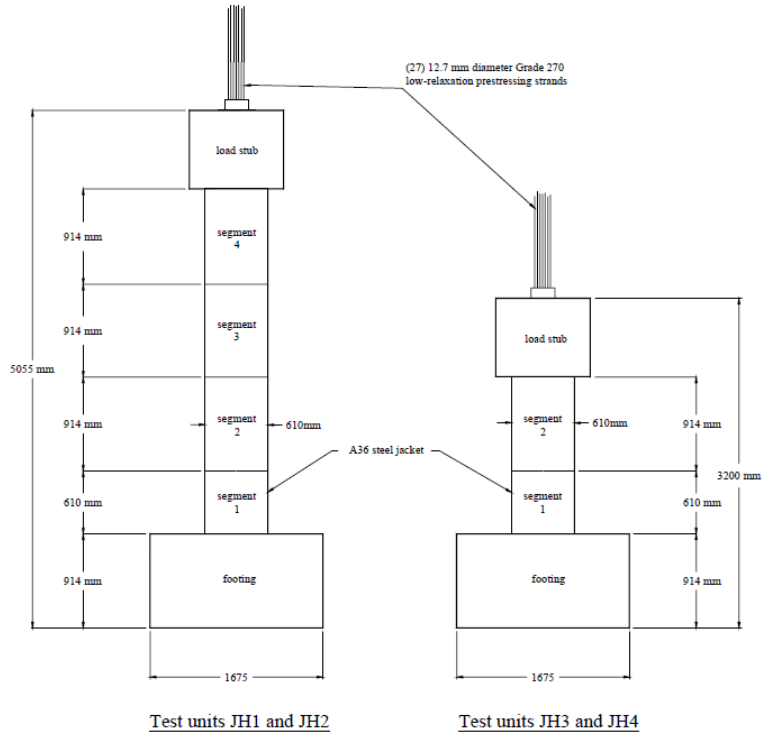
Geometry of precast column units tested by Hewes and Priestley (2002)
